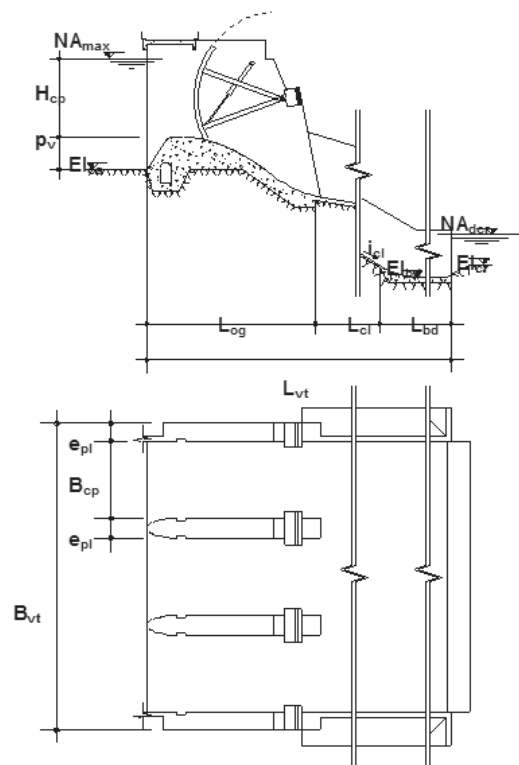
Typical cross-section of a gated surface abutment spillway with a stilling basin.
